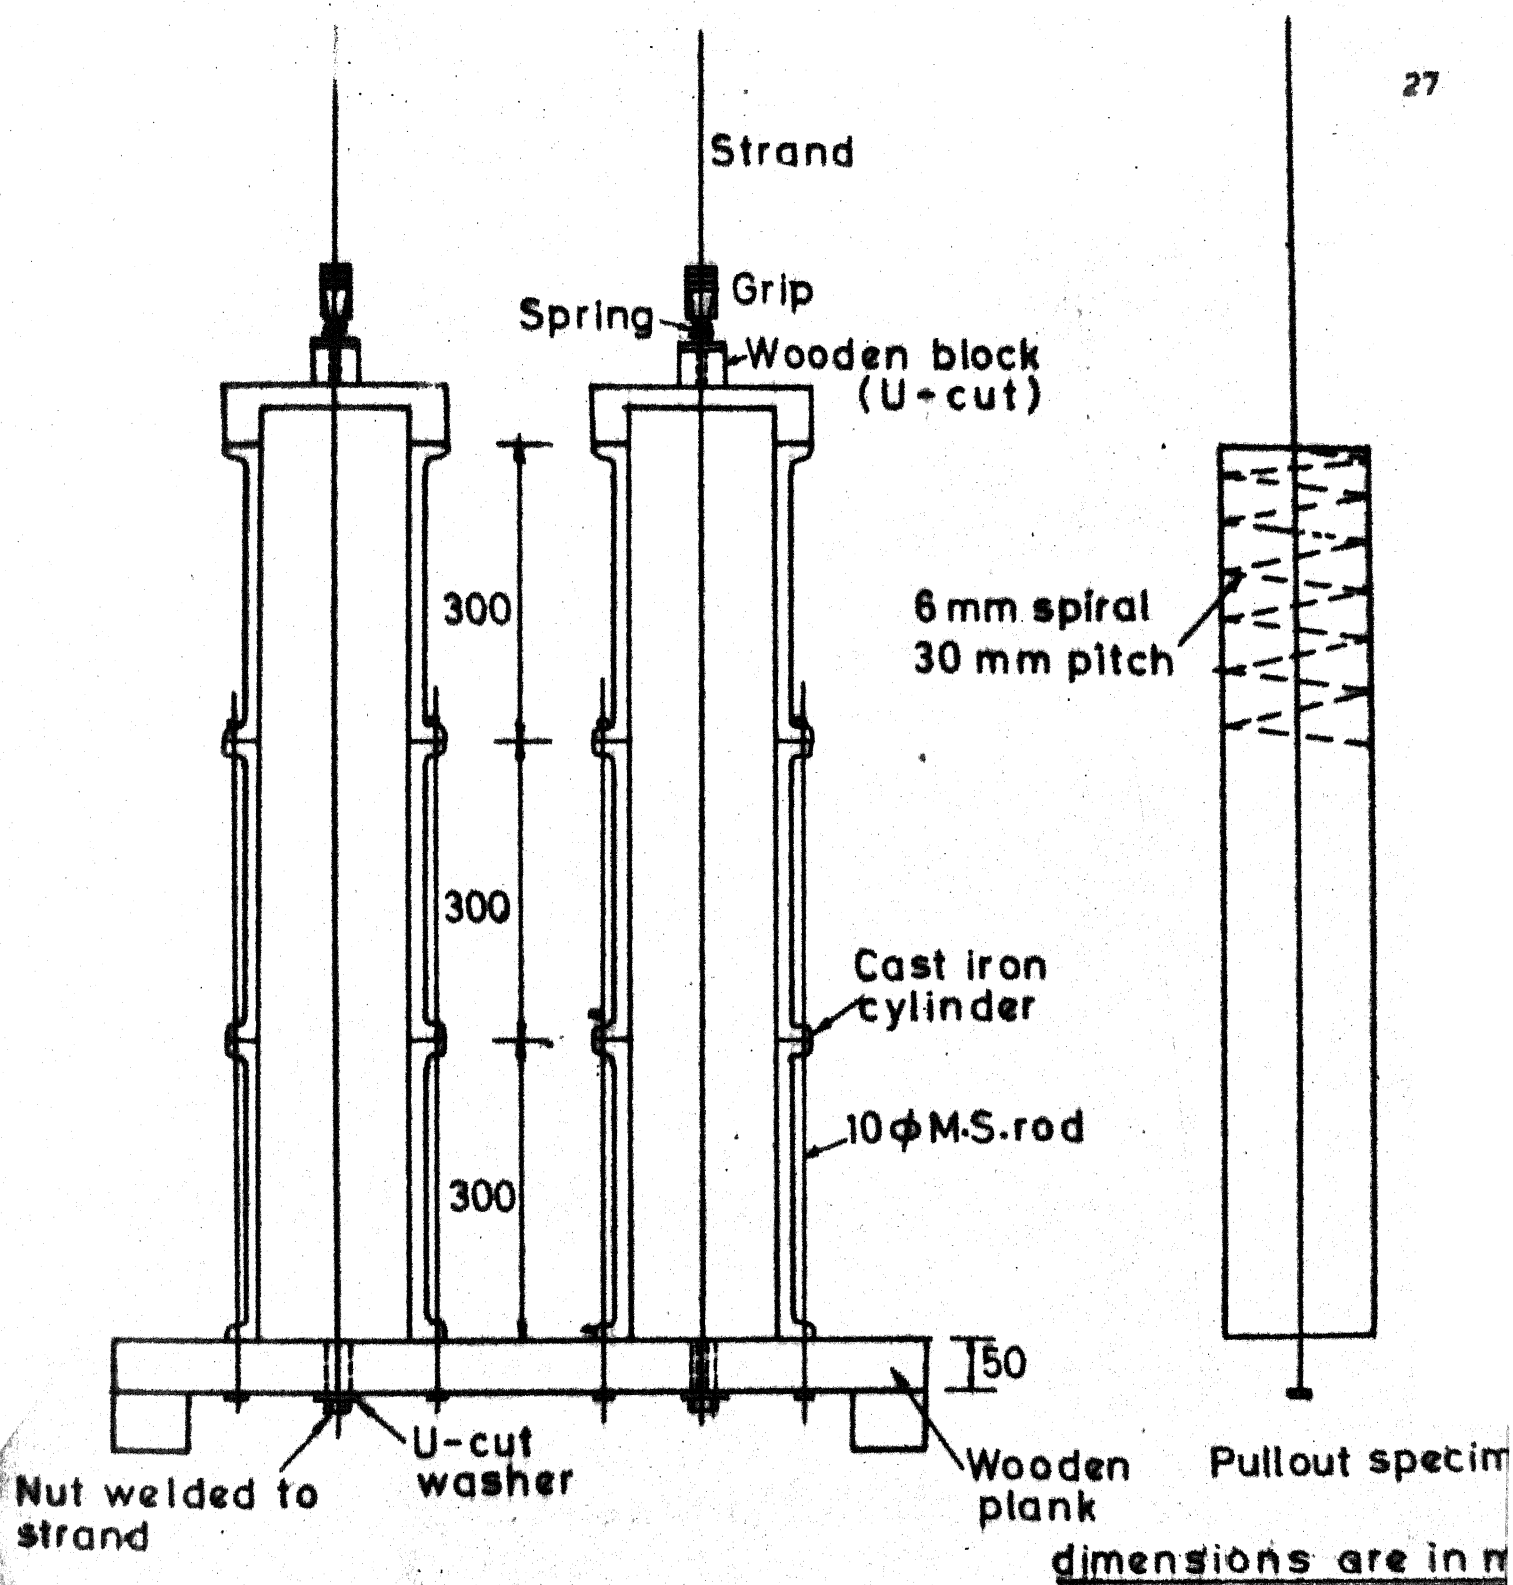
DETAILS OF MOULD FOR PULL OUT SPECIMEN
